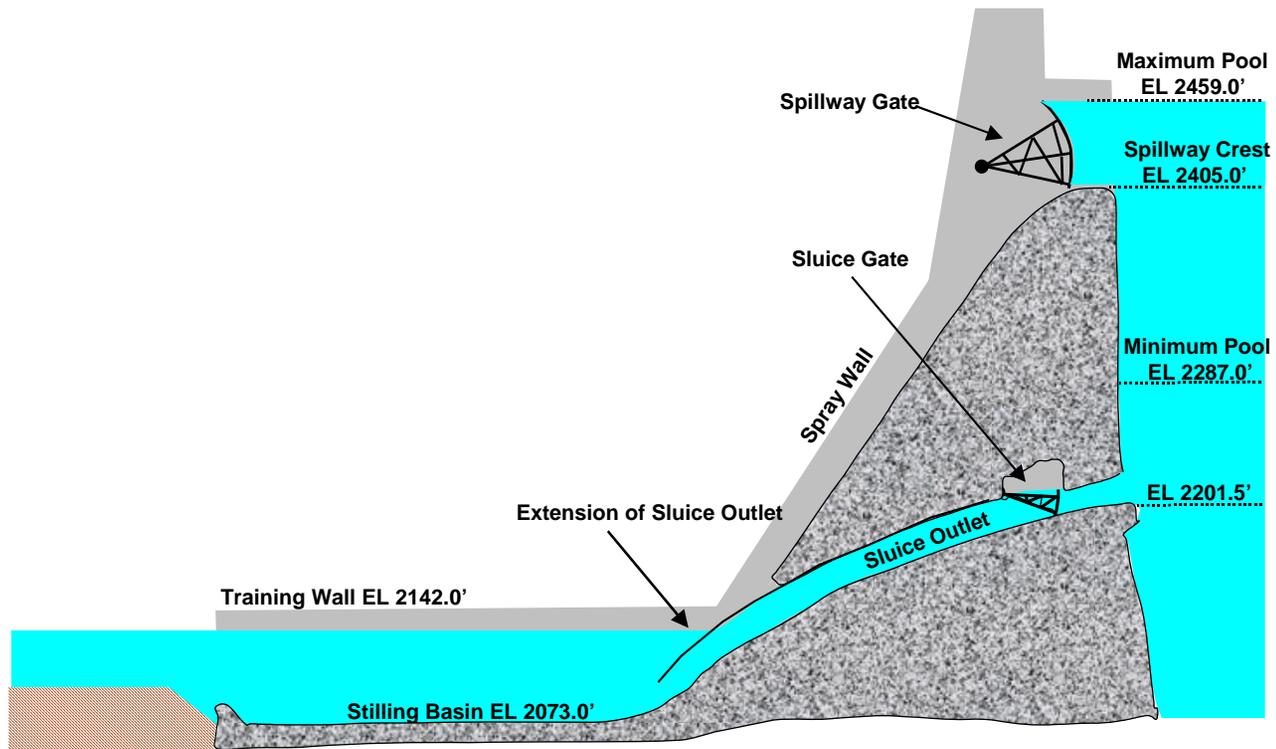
Extension of Sluiceway Outlets, Alternative 9
